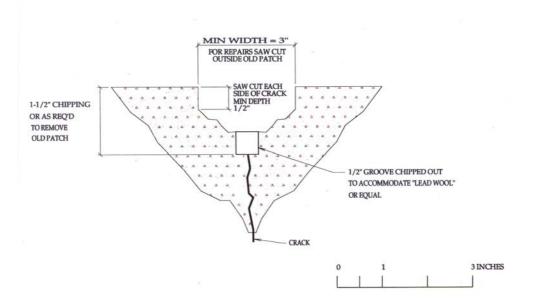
Schematic of Preparation of Concrete Lining at Crack
